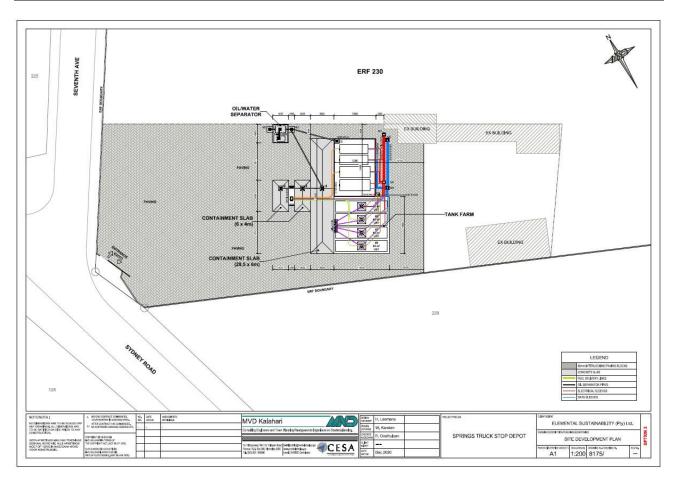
Preferred Option of the Proposed Fuel Depot Facility Illustration and Site Layout
